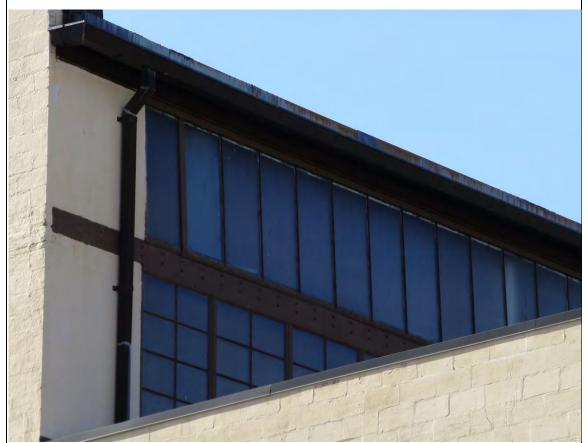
Building 2750, close-up of original steel multipane windows on the north side of the monitor roof (ERDC-CERL, 2013).
